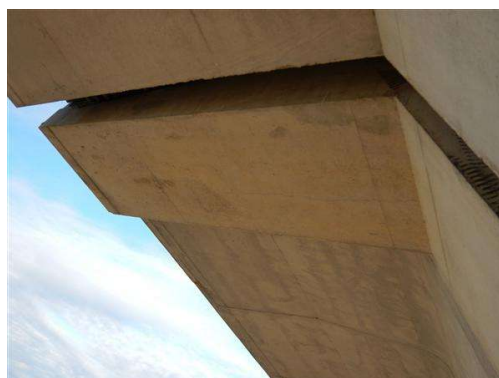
Longitudinal cracks in the bottom face of PT pier end segment at Pier 30SB
